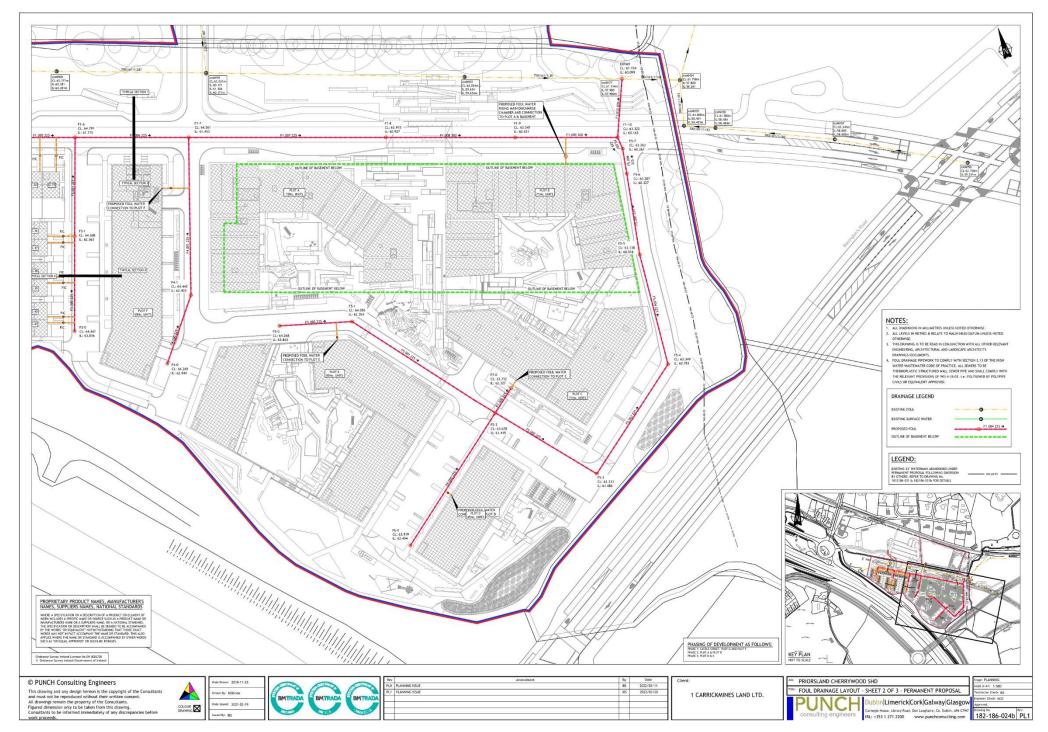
Foul water drainage – Permanent Proposal (sheet 2)
